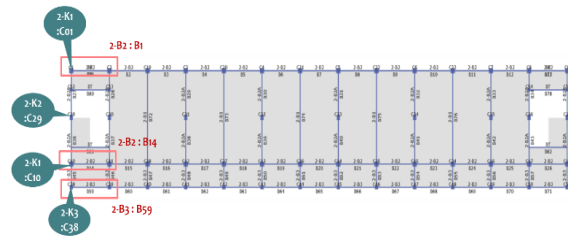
Structural elements that have not been able to withstand the tsunami load.
